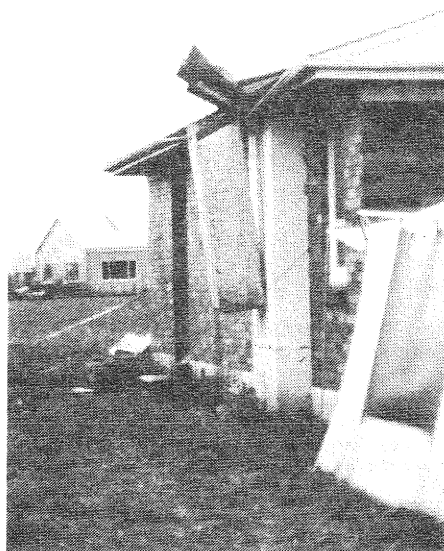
A reinforced pumice concrete chimney where the poorly grouted reinforced rods had partially withdrawn
